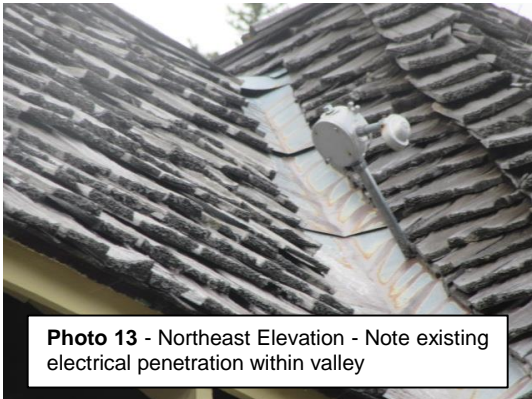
Northeast Elevation - Note existing electrical penetration within valley
